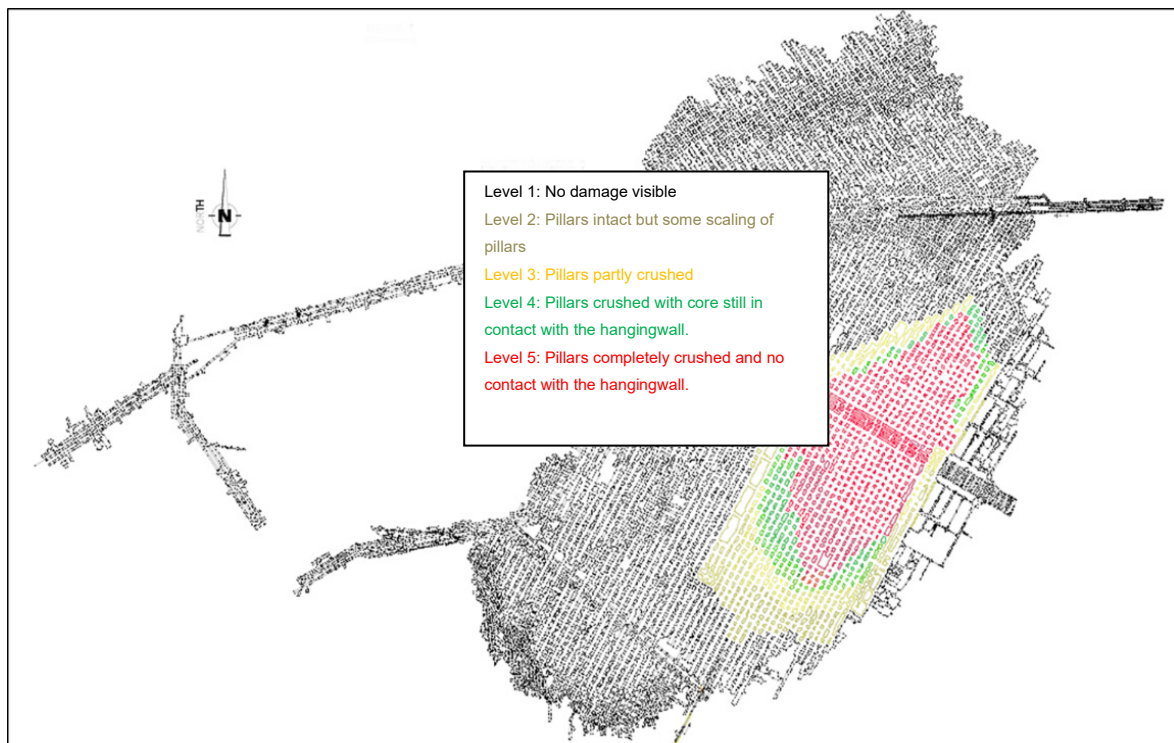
Plan view of Everest Platinum Mine showing the extend of the pillar failure and the conditions of the pillars after failure in 2008 (after Lombard, 2008).
